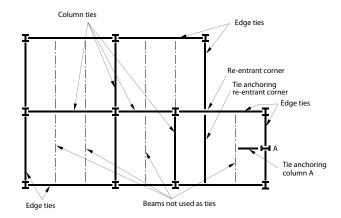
Tying of Columns – Beams connecting columns only and at reentrant corners used as Ties
